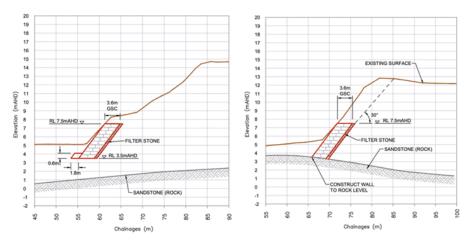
Concept Sketch of partially buried GSC revetment showing cross section A (southern section, left) and F (northern section, right)
